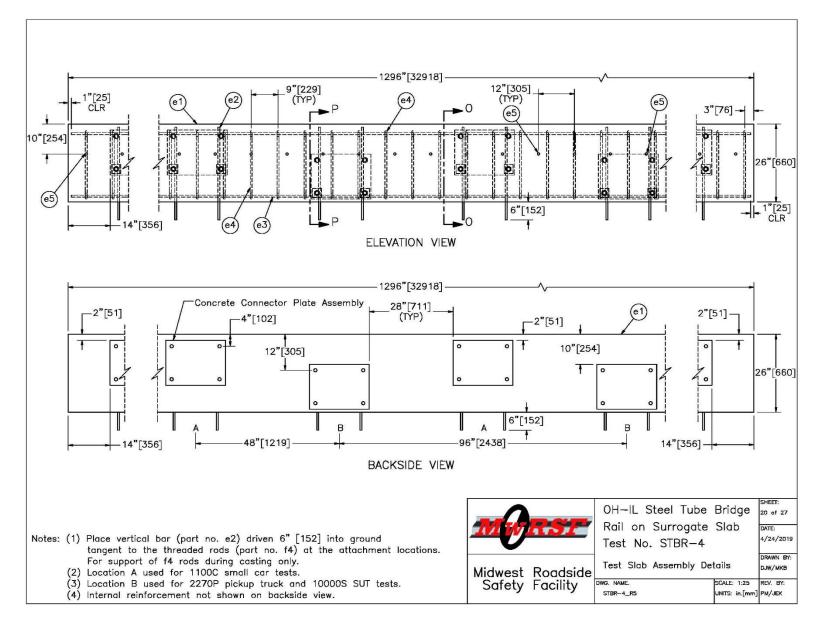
Test Slab Assembly Details, Test No. STBR-4
